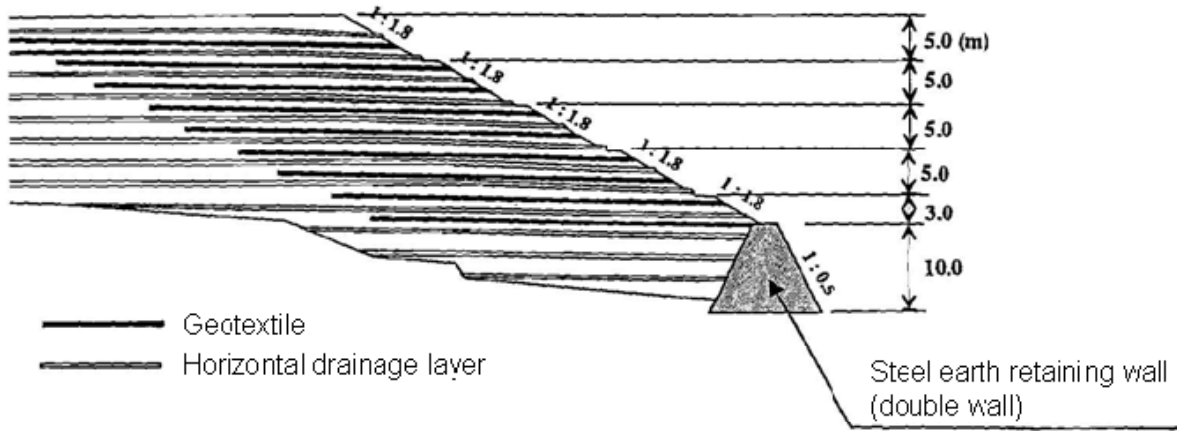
Layout of the geotextiles and the horizontal drainage layers
